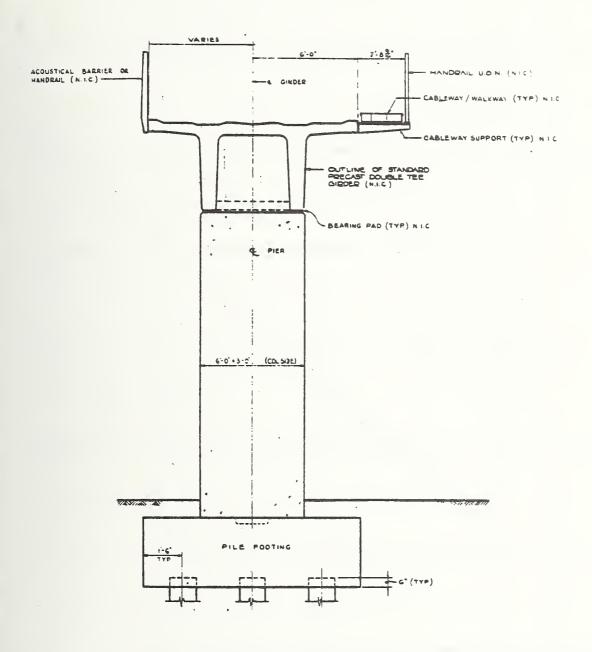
TYPICAL SECTION OF PROPOSED DADE METRORAIL ELEVATED STRUCTURE
